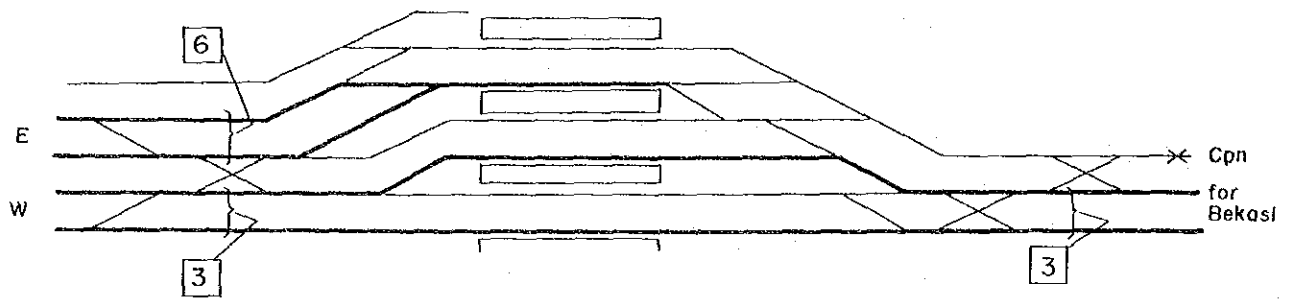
Track Layout (identical with Alternative 1) of Master Plan
